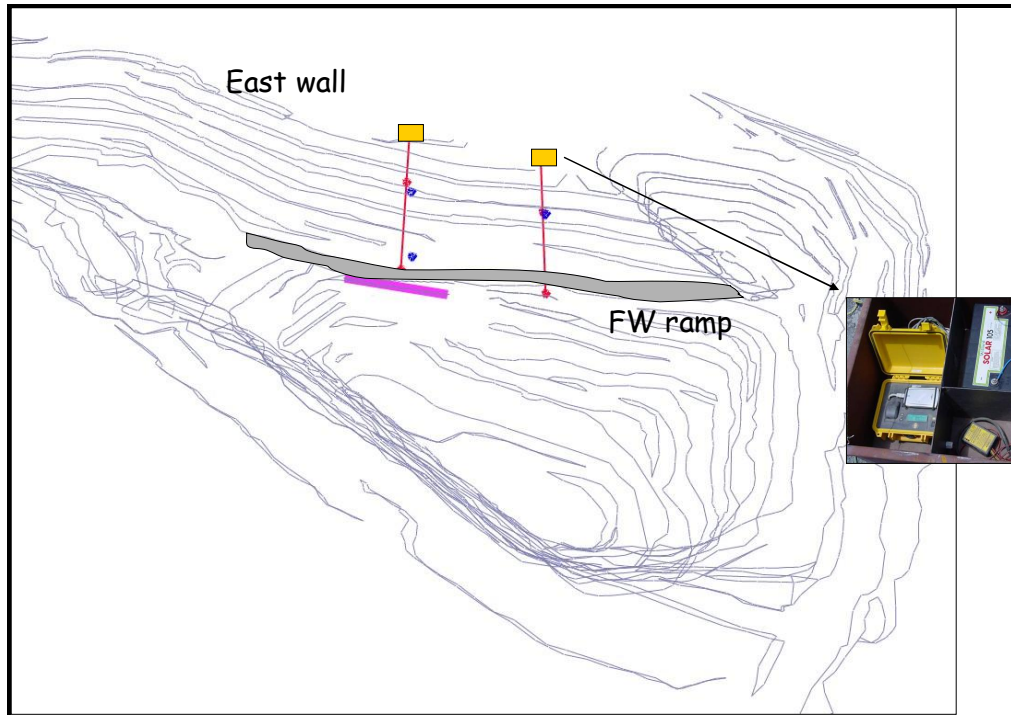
ISSI setup in Sandsloot open pit east wall above the gabion ramp.
